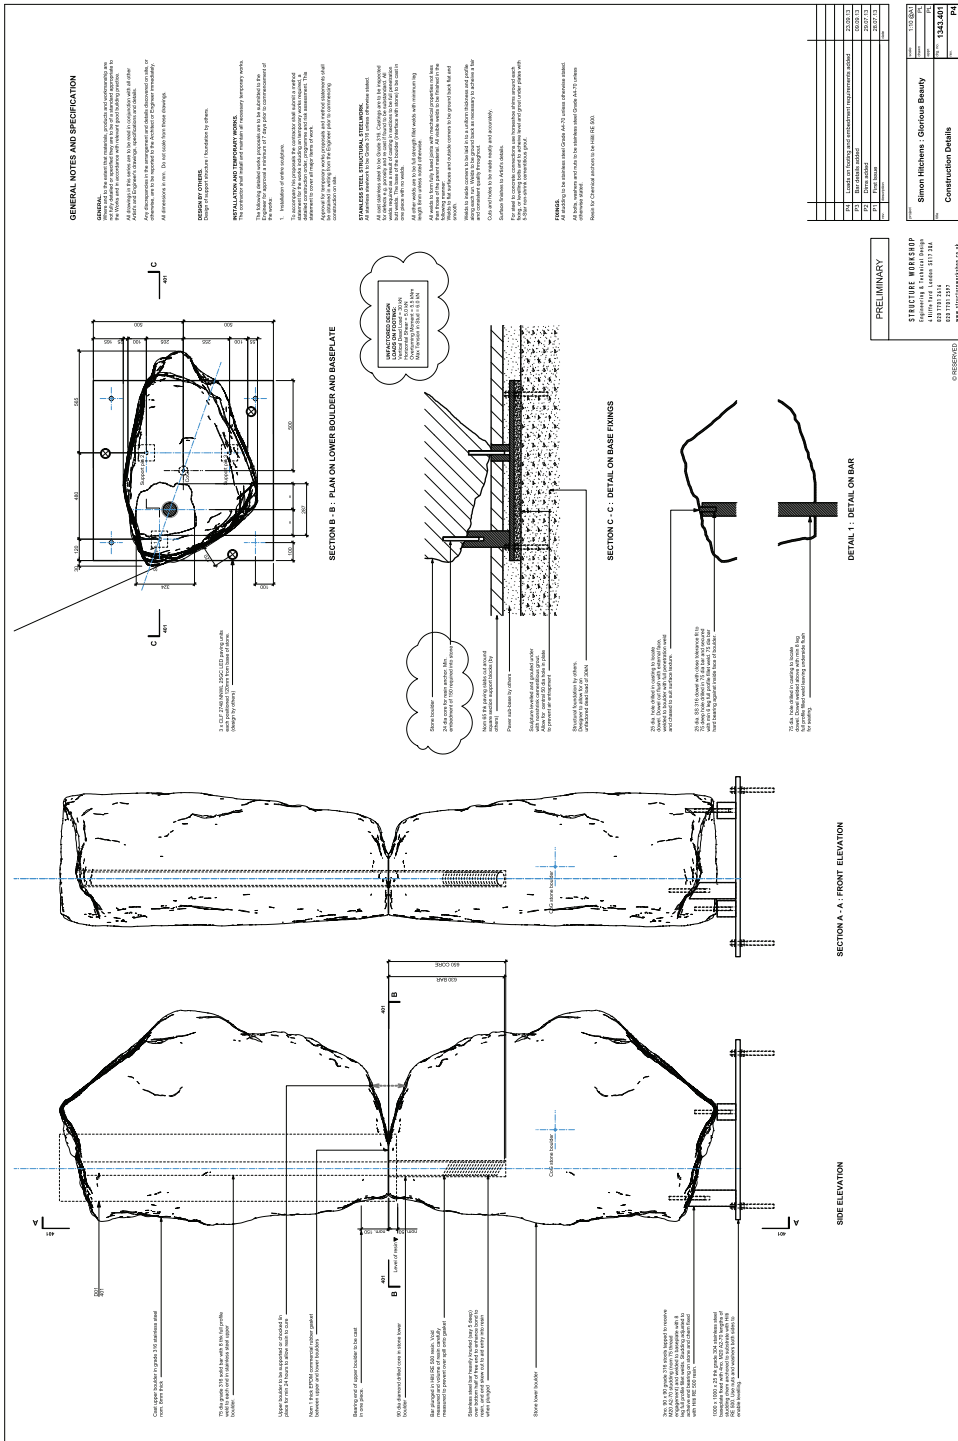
CAD drawings of the stainless steel and stone sculpture *Glorious Beauty* by Simon Hitchens, including details of the 75 mm diameter stainless steel rod stabilising the structure, and the underground stainless steel base plate with welded-on stainless steel blocks which the sculpture is bolted and resin bonded to. (© Simon Hitchens. Reproduced with permission.)
